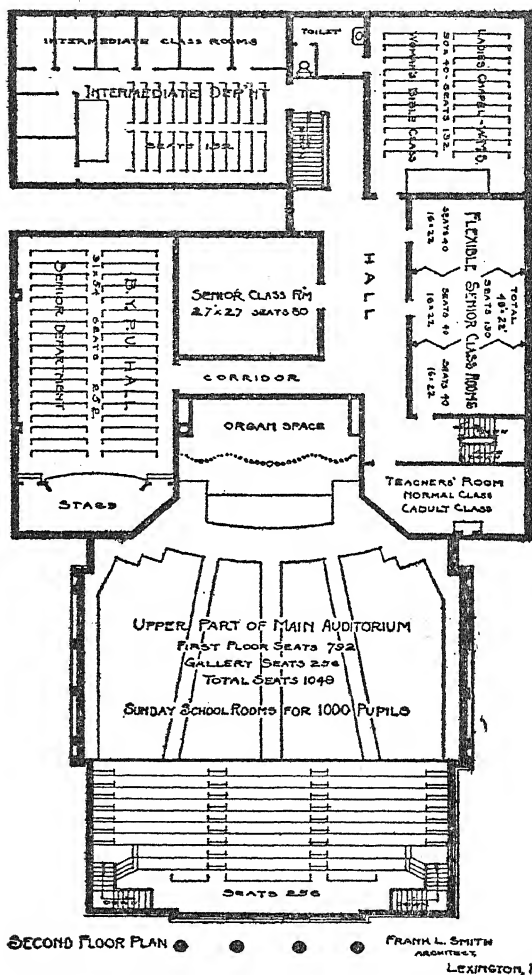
Second floor plan. First floor plan shown on preceding page.
